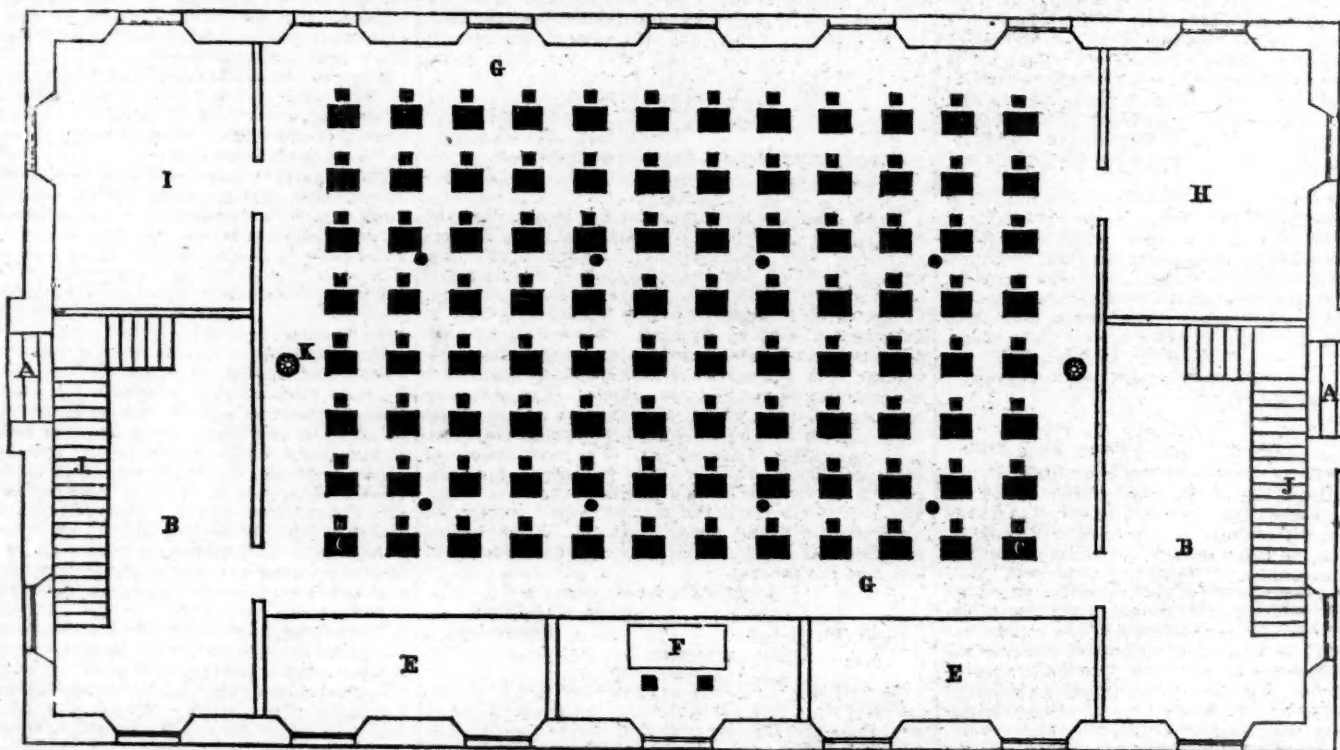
LOWER SCHOOL ROOM.—Scale, 1-12th inch to a foot.
